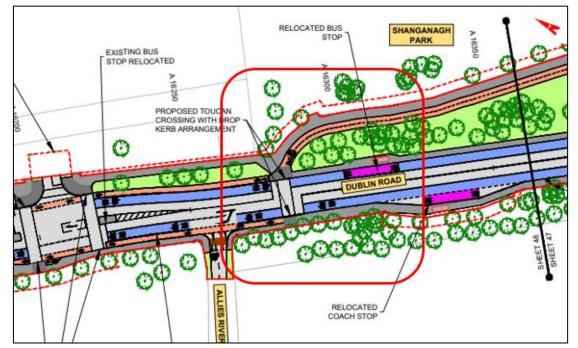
Extract from General Arrangement Drawings showing Proposed Toucan Crossing at Chainage 16+280 (Sheet 47)
